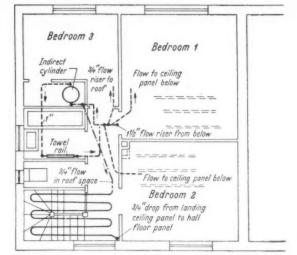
B.—System 5, embedded ceiling panels, showing method of laying pipes.
